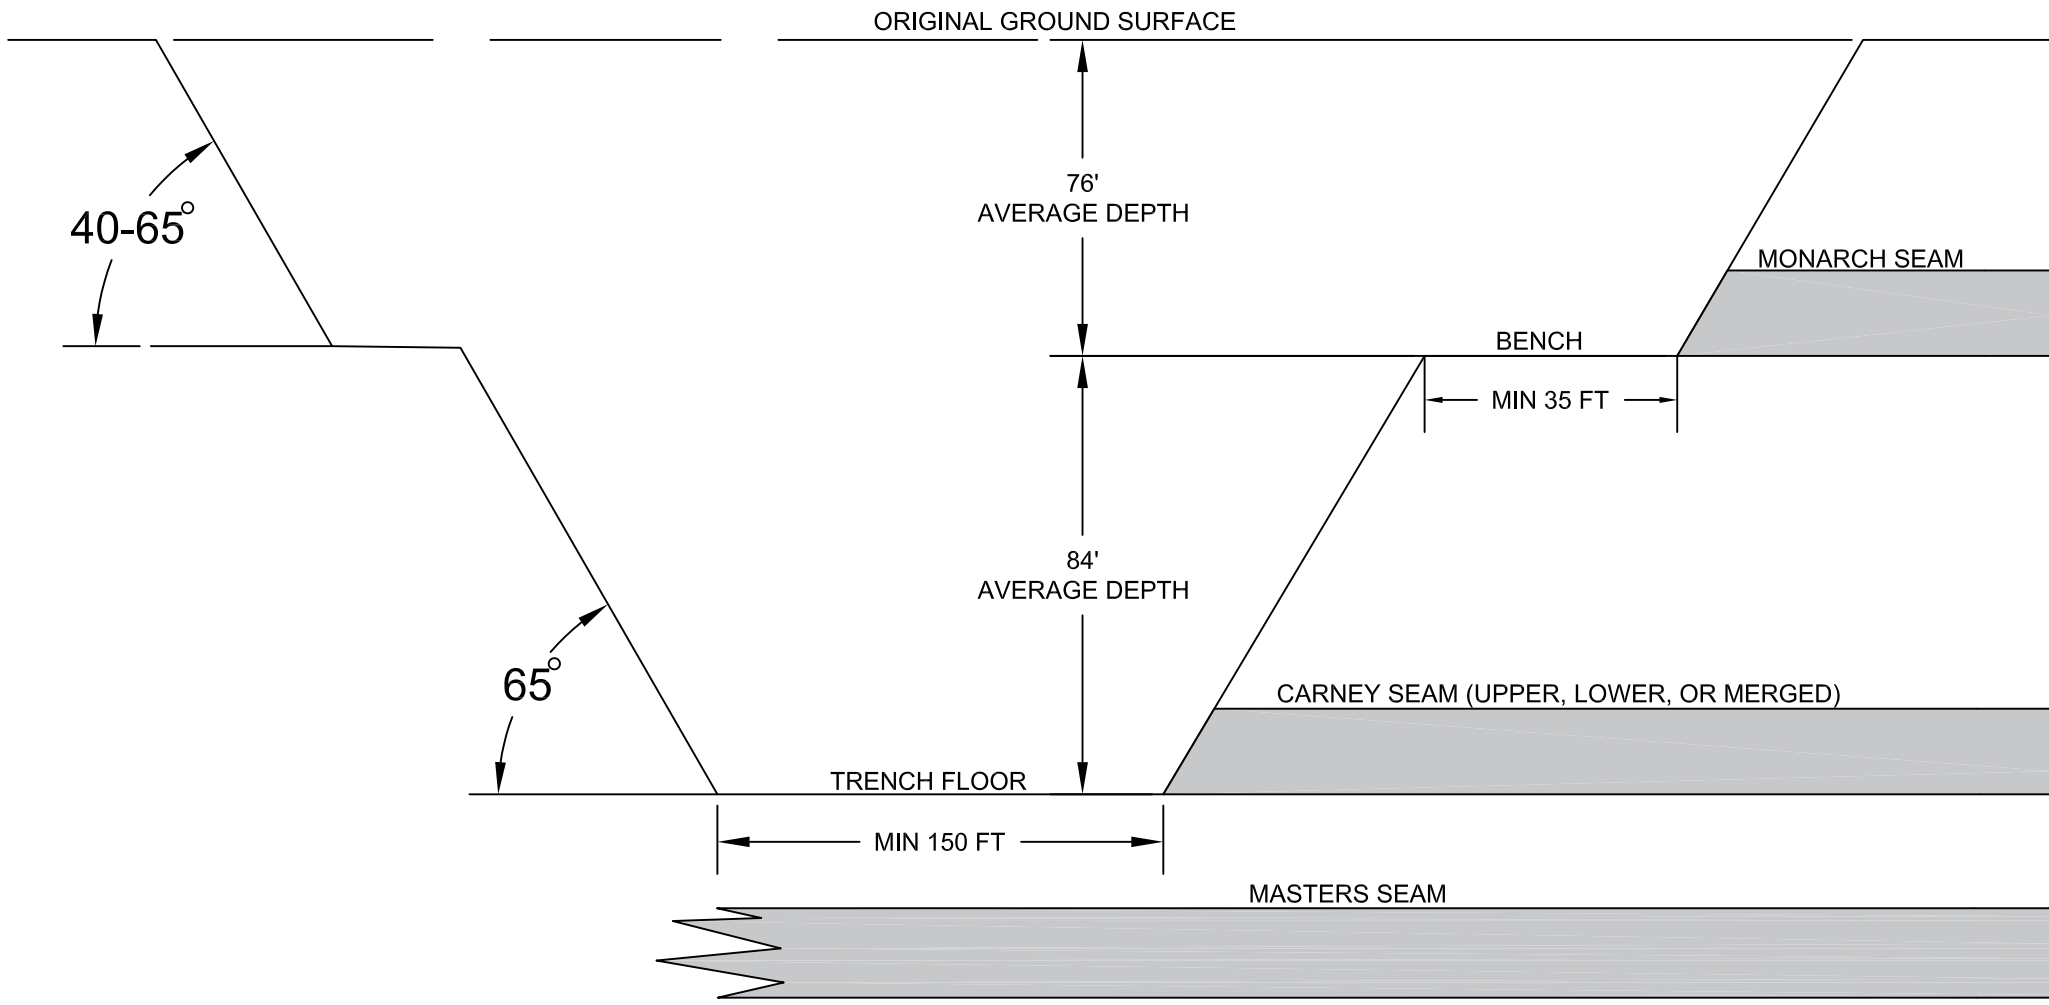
ILLUSTRATION OF PROPOSED HIGHWALL MINING OF COAL VIA STRIP-MINED TRENCH EXCAVATIONS (SEE P. MP-F2)
